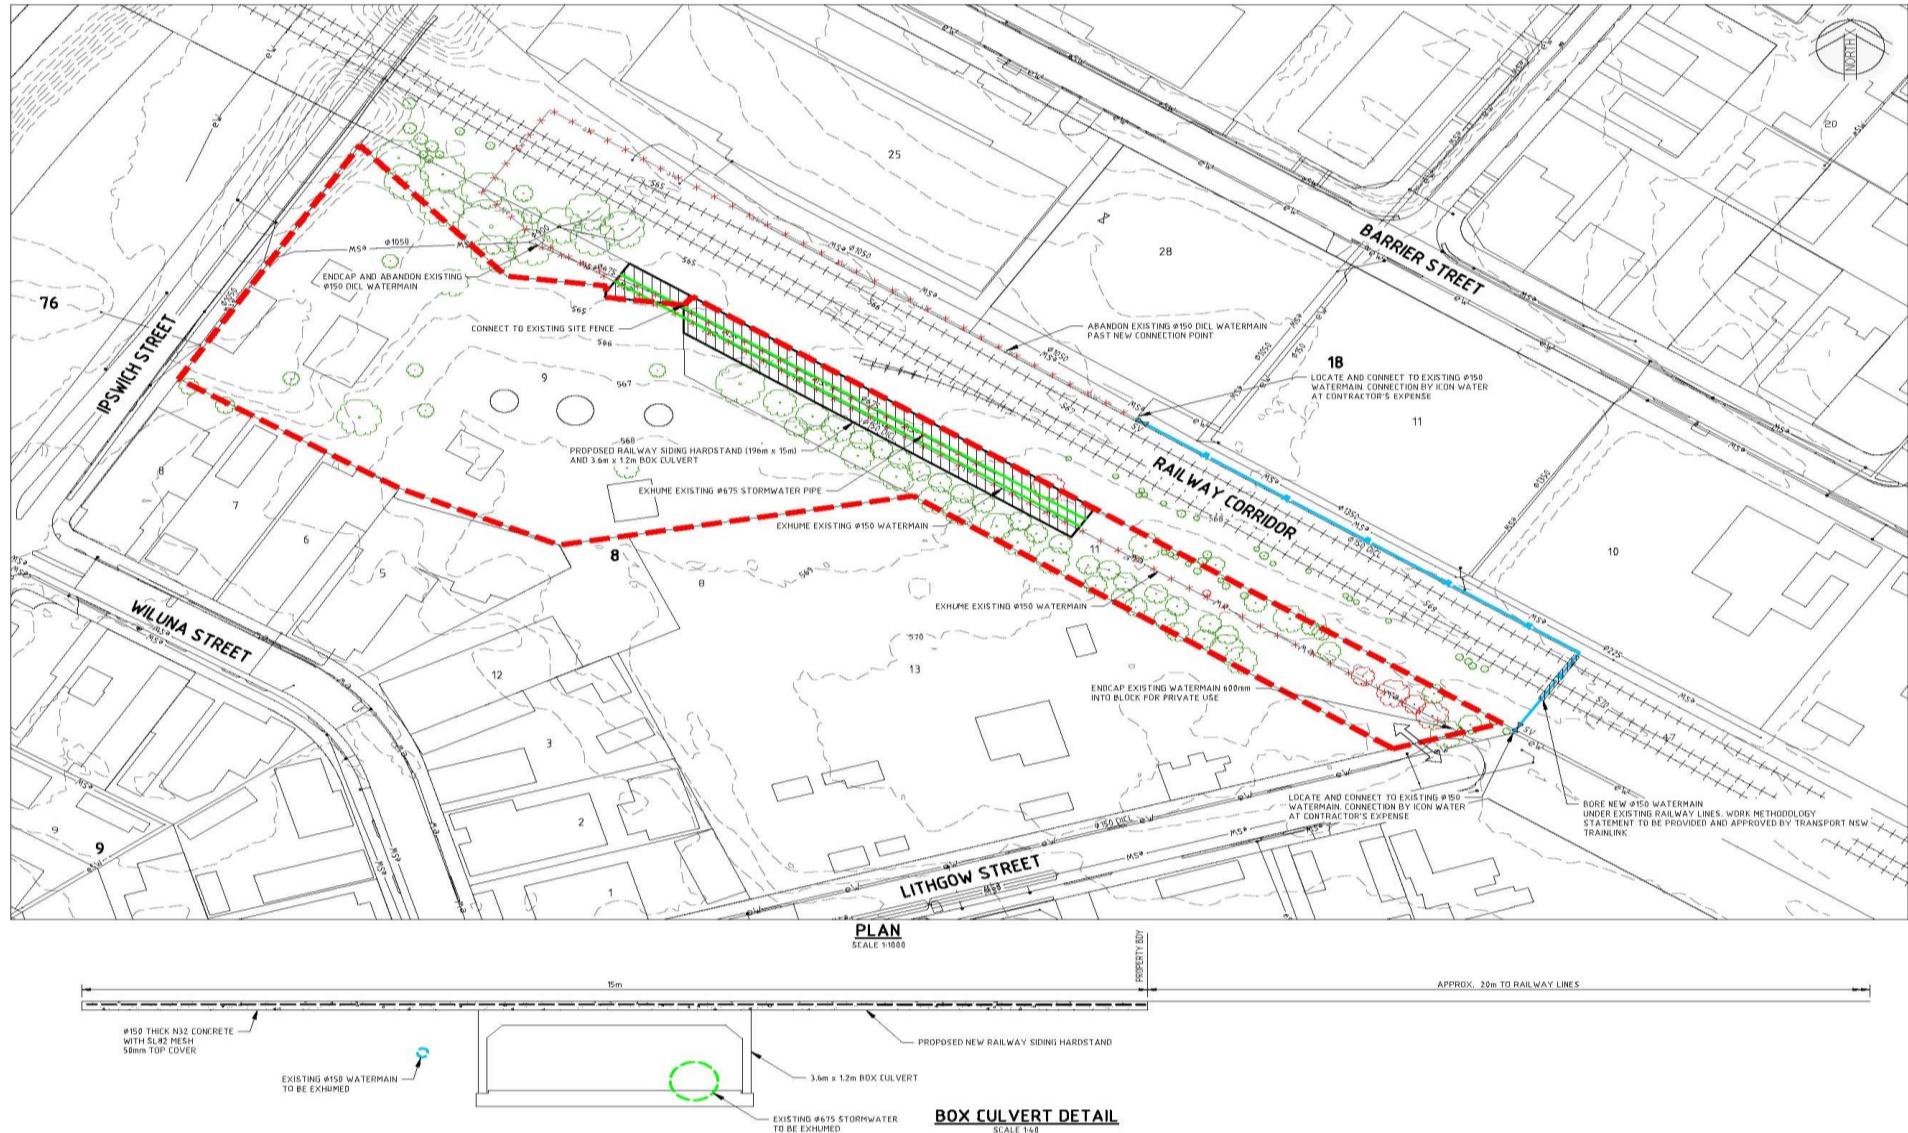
Cardno Site Investigation - Water and Stormwater Plan (Source: Cardno)
